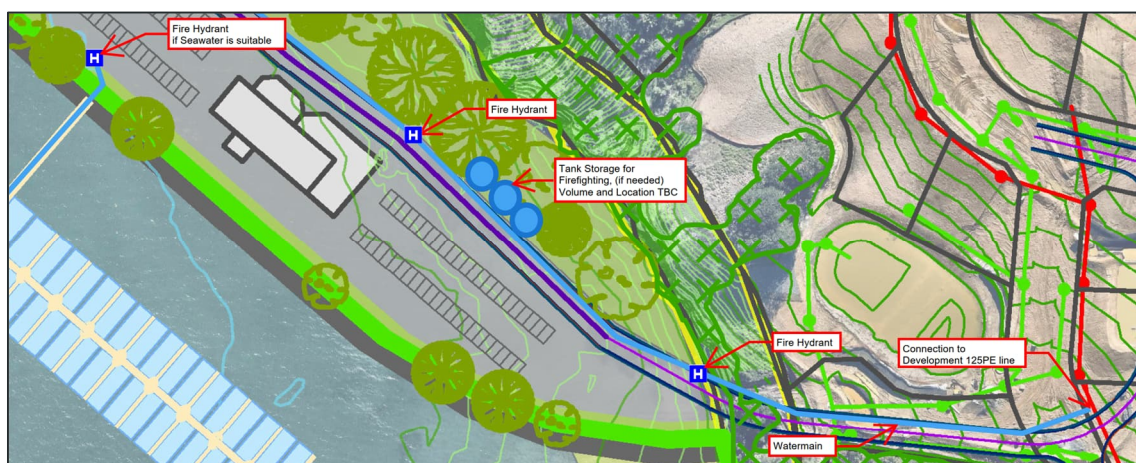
Proposed Water supply connection to 125PE in Subdivision Network
